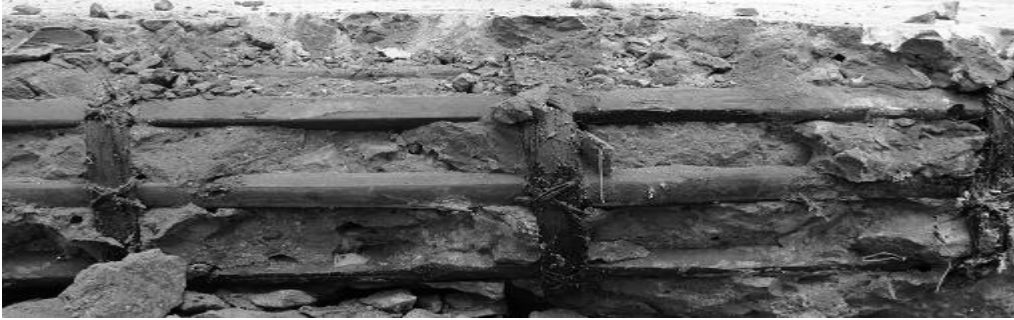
Post failure condition of 1.5% bamboo reinforced concrete beam
